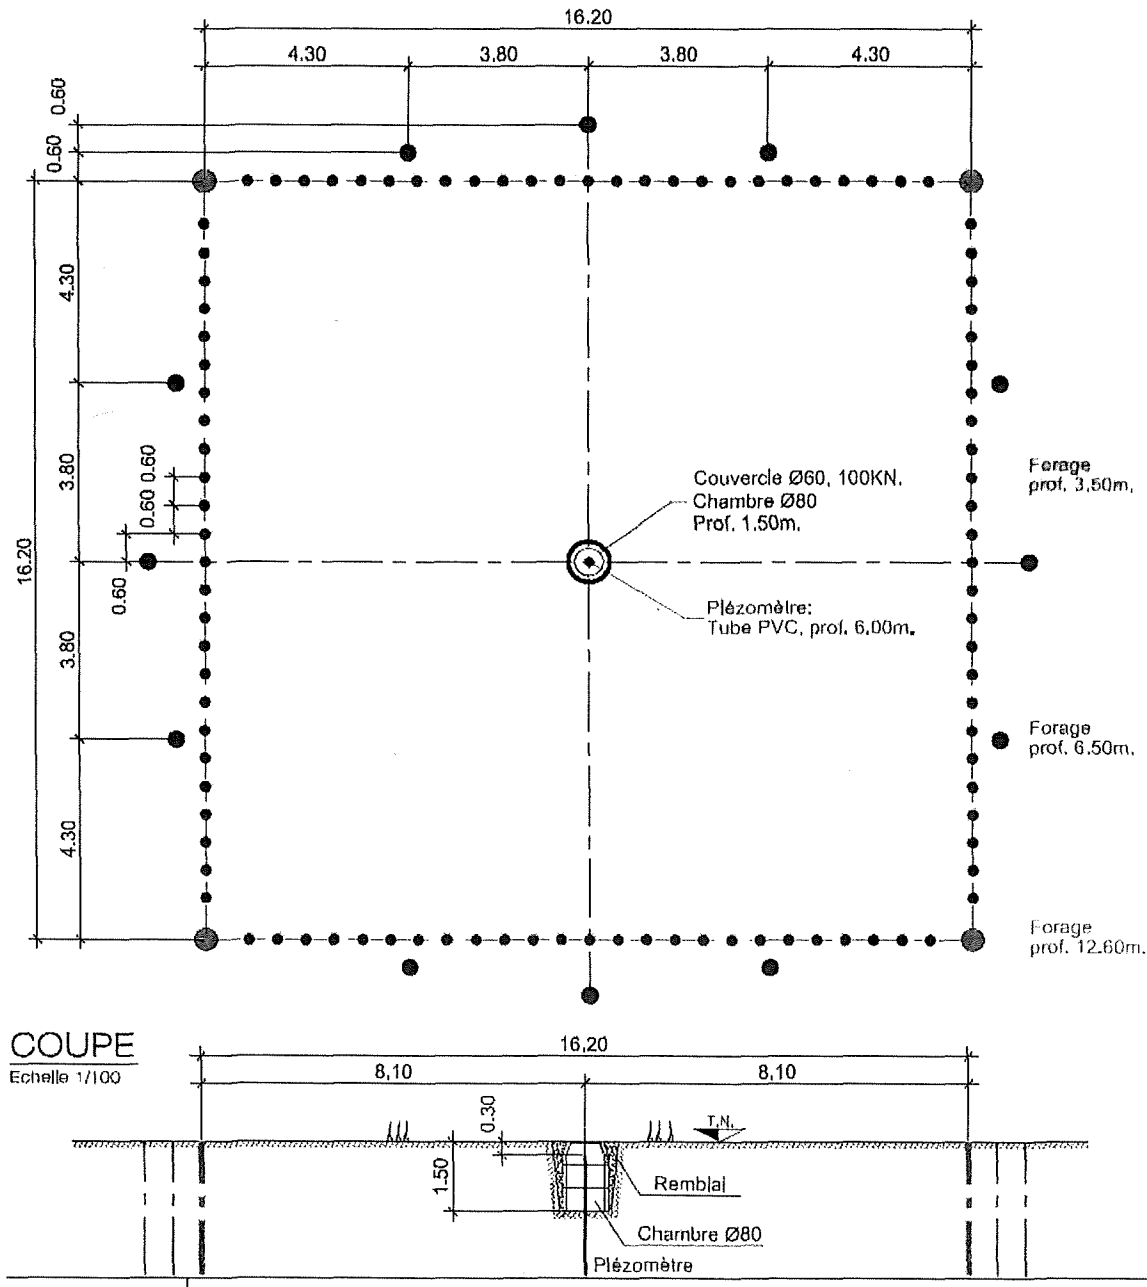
Layout of EGRP® system at GIA (GADZ 2014).
